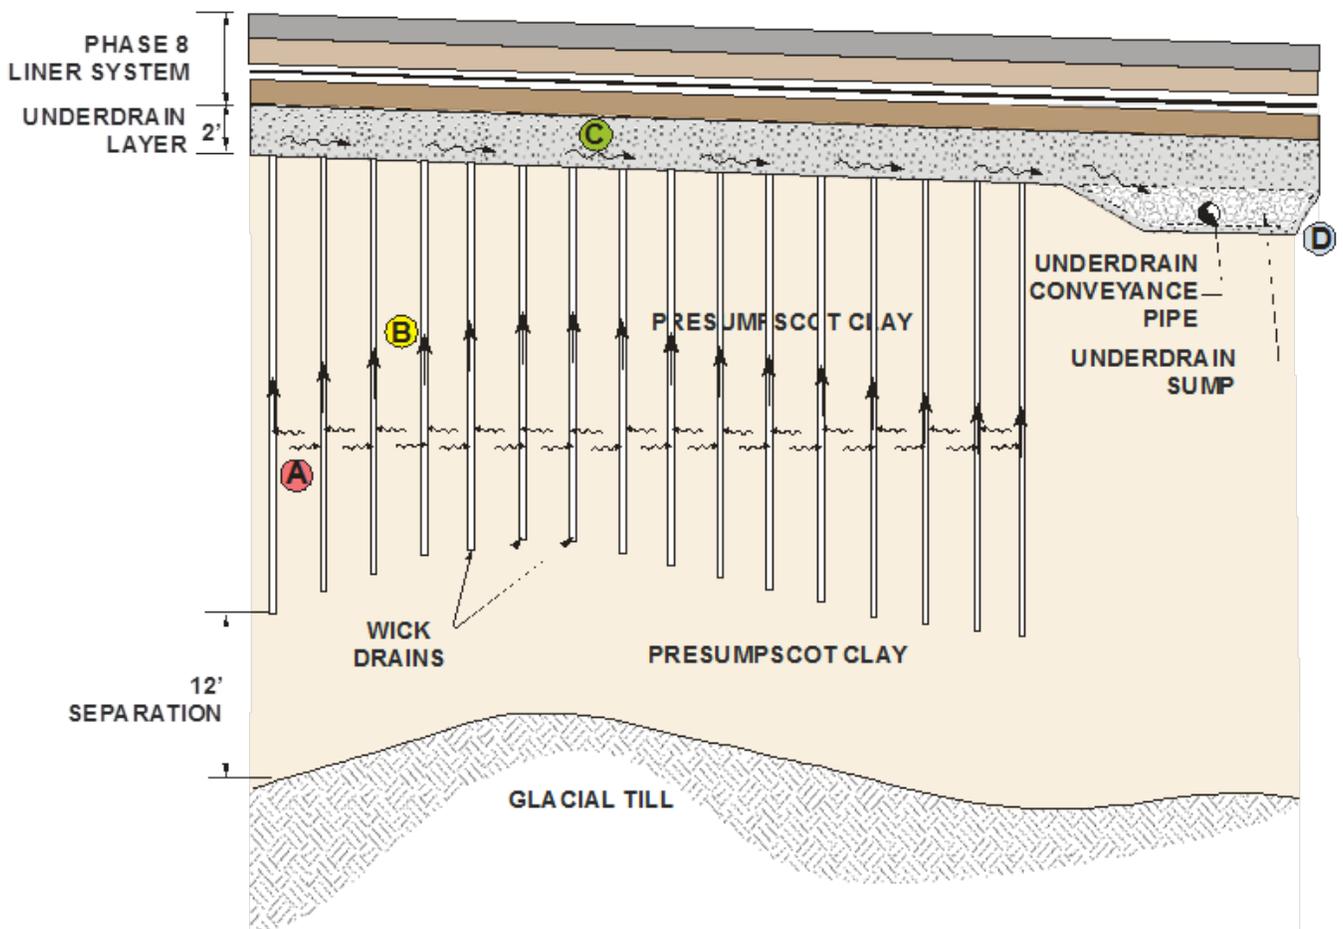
Profile illustration of prefabricated vertical drains (wick drains) and blanket underdrain beneath landfill liner system
